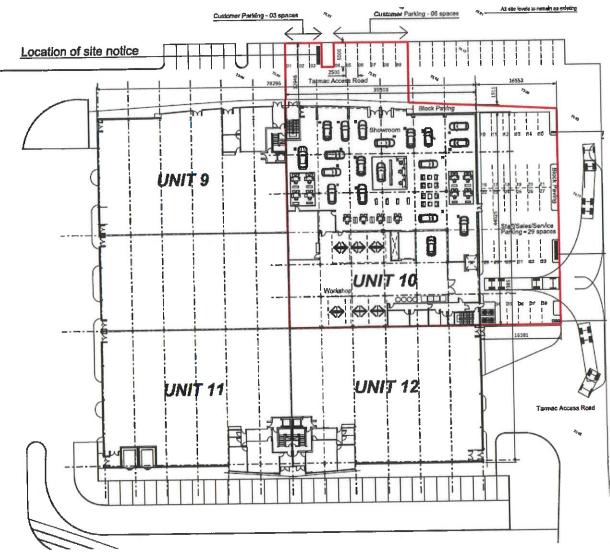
Existing site layout plan submitted under Reg. Ref. FW18A/0015
